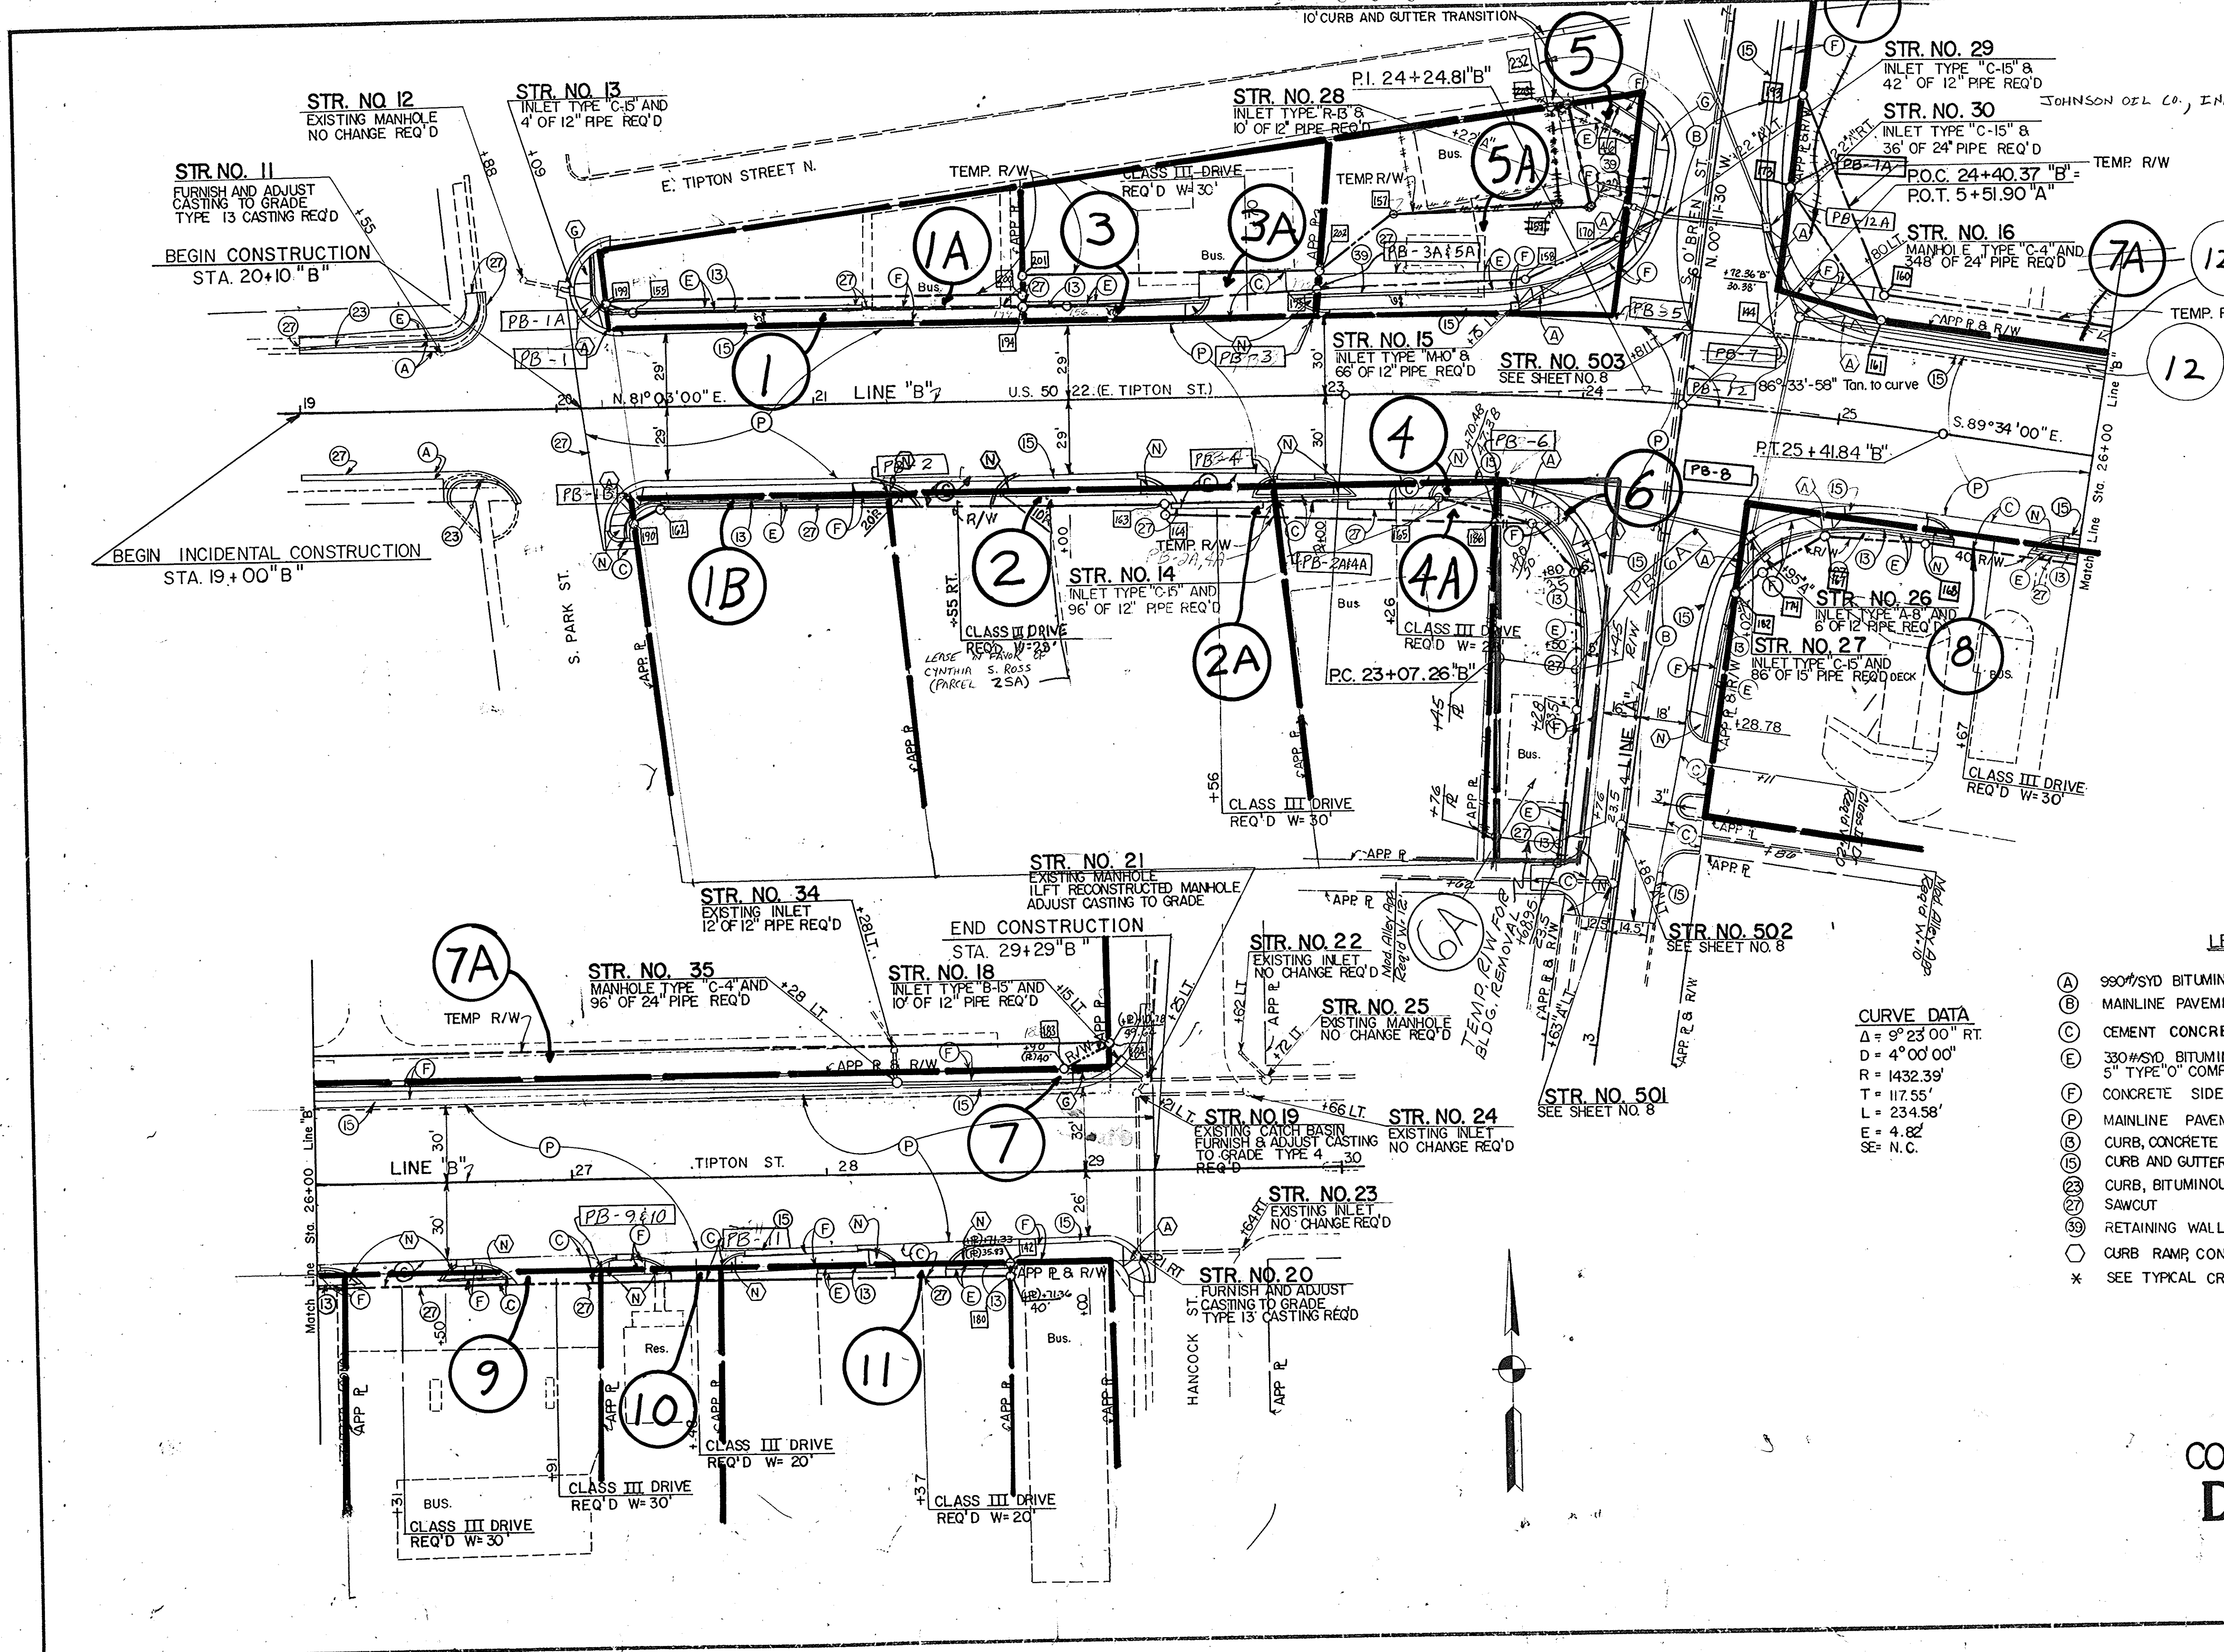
SINGLE PLAN AND PROFILE-FULL LINE
